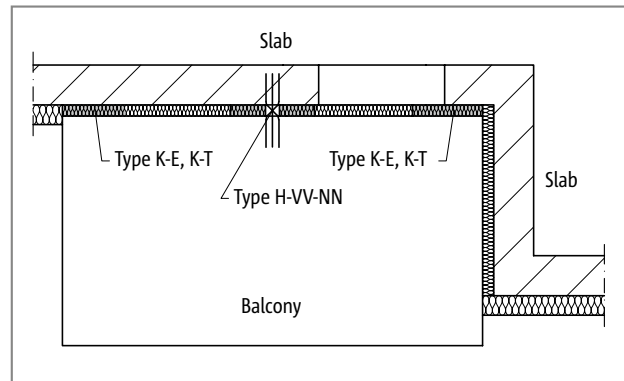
Schöck Isokorb® T type H: Cantilevered balcony
